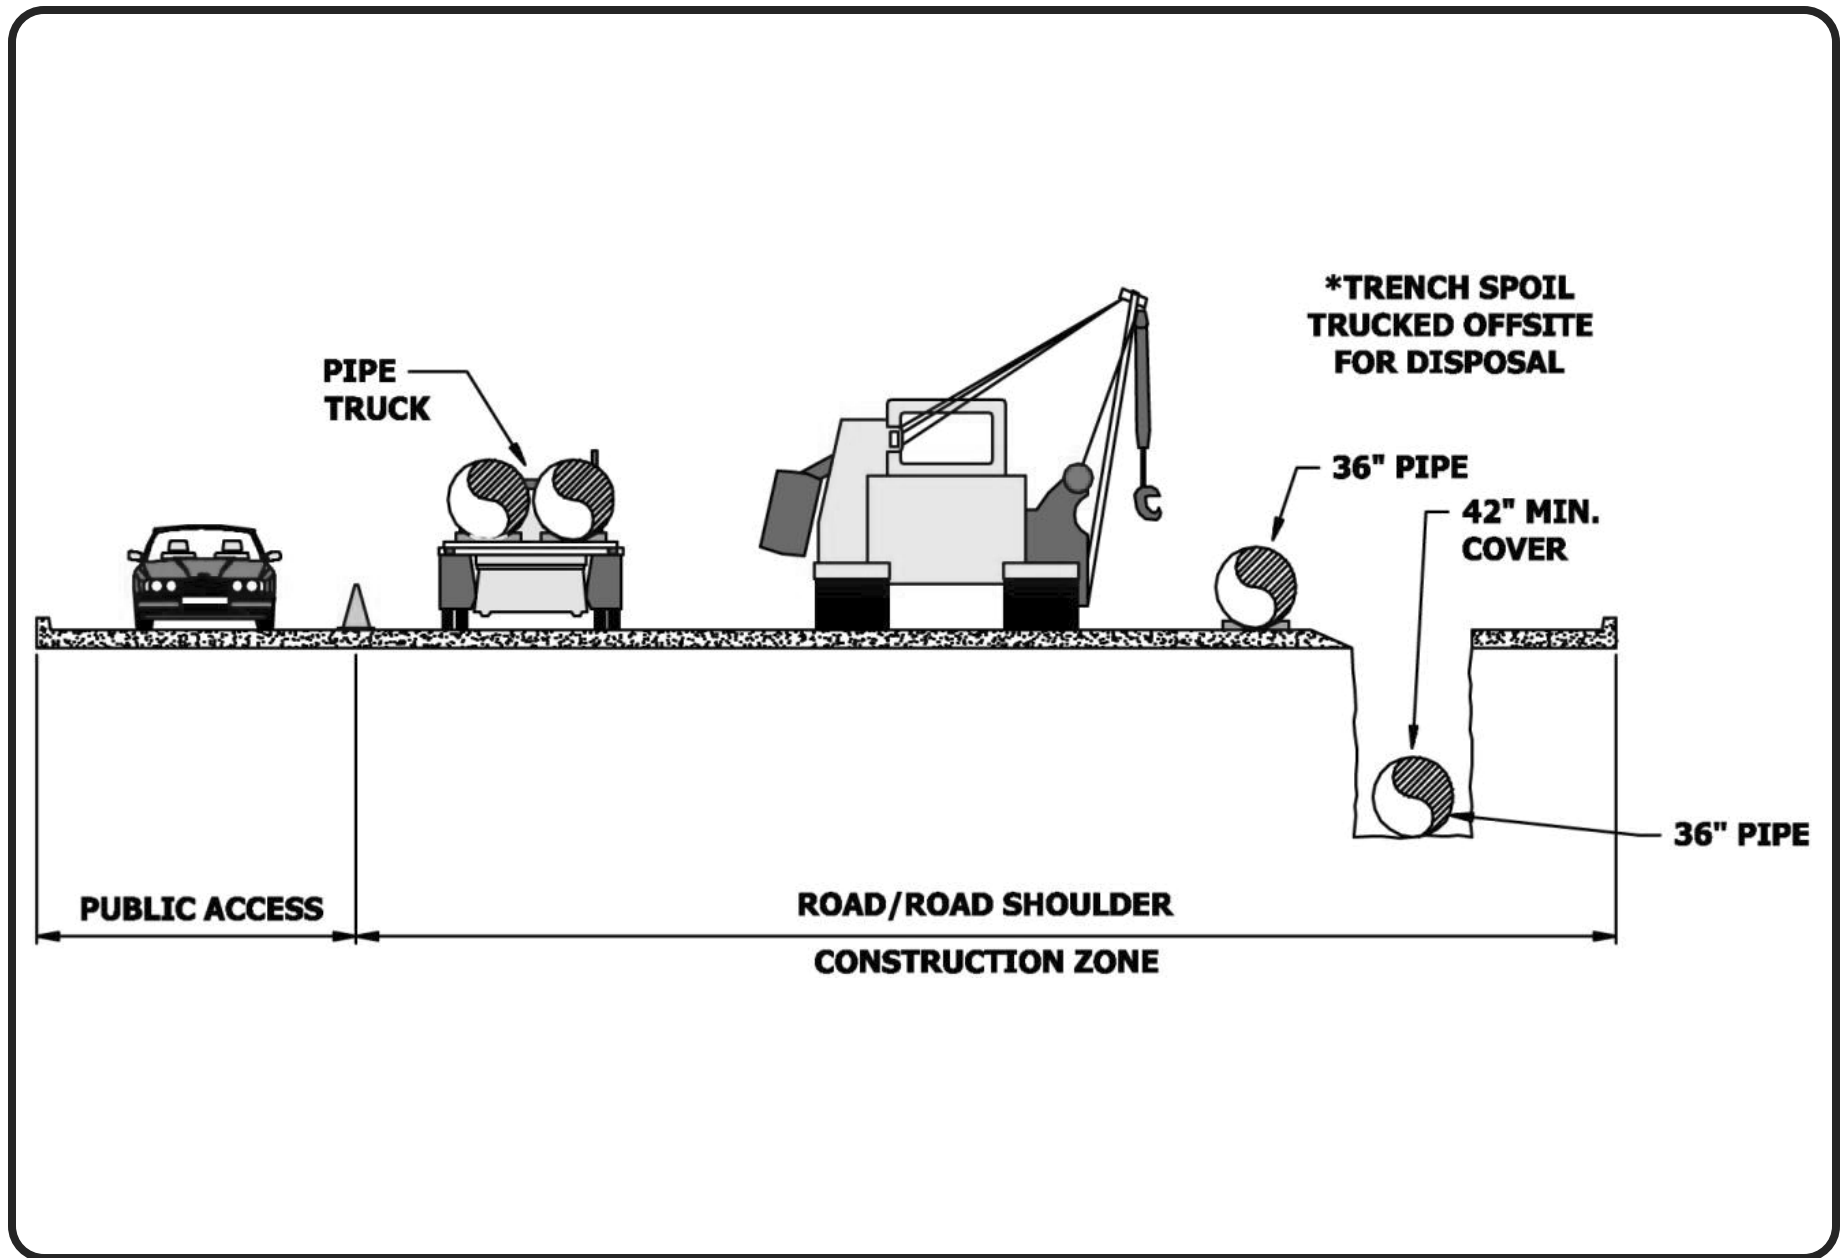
Typical Urban ROW Cross-Section, Option 1
